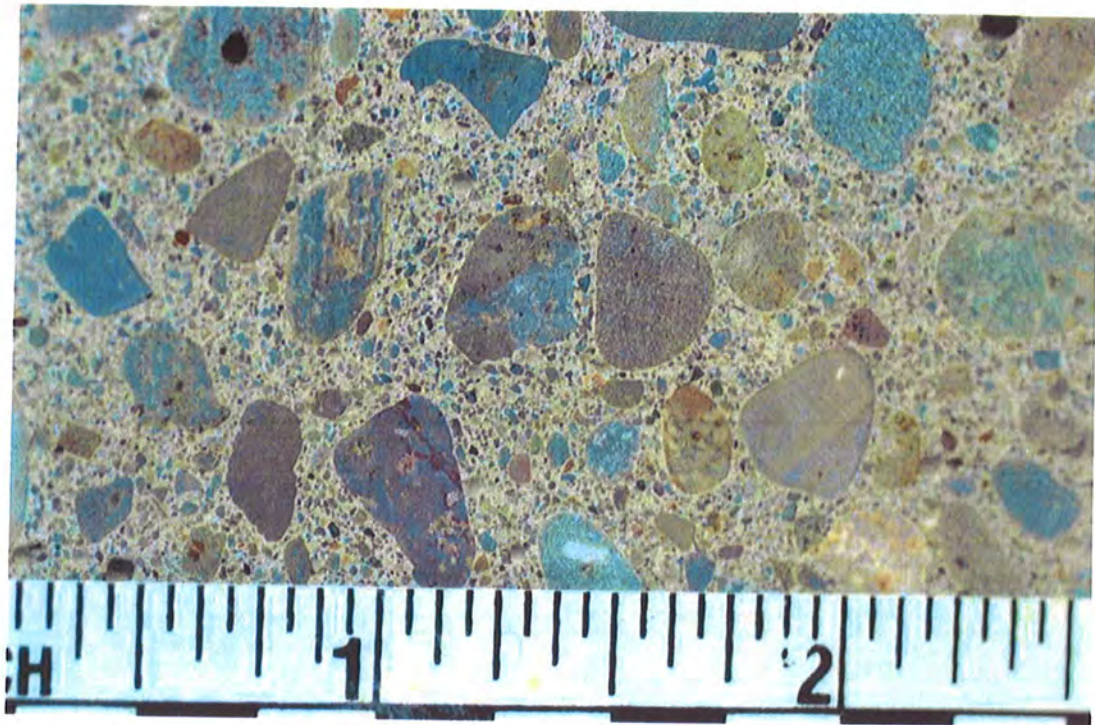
Closer view of sawed surface through Core 5CCA shows similar features.
